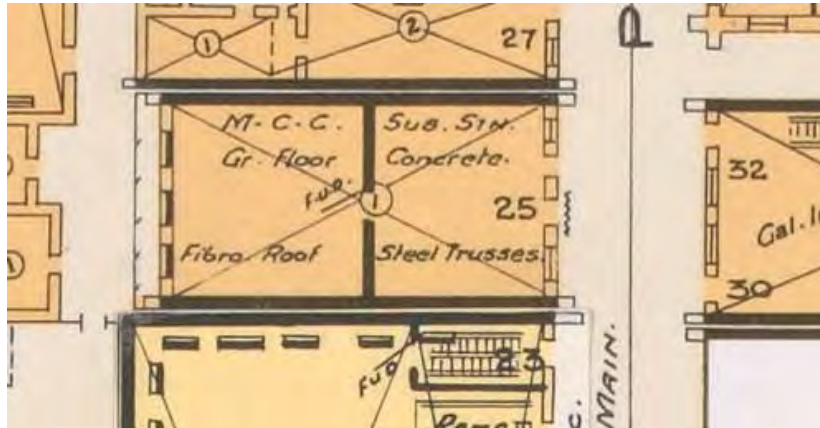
Detail from 1948 Mahlstedt plan shows rebuilding to the subject property. (Source: Mahlstedt Map Section 1, no 6, 1948)
